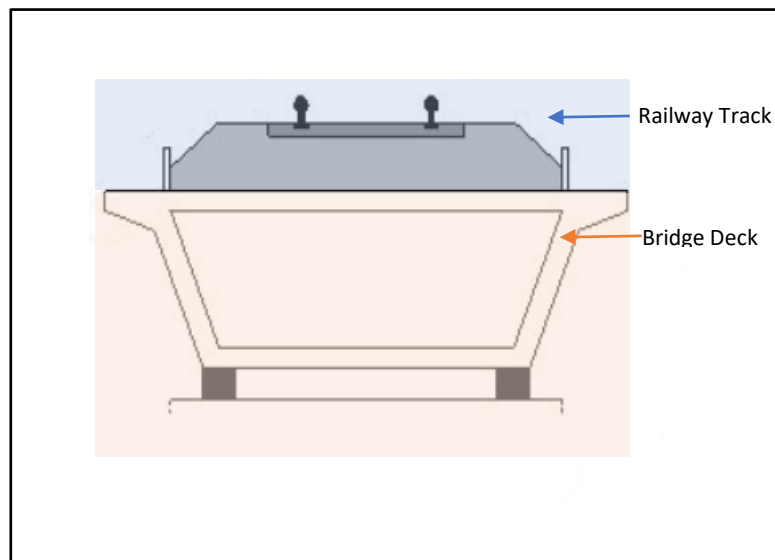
Depiction of the two sub-systems of a railway bridge.
